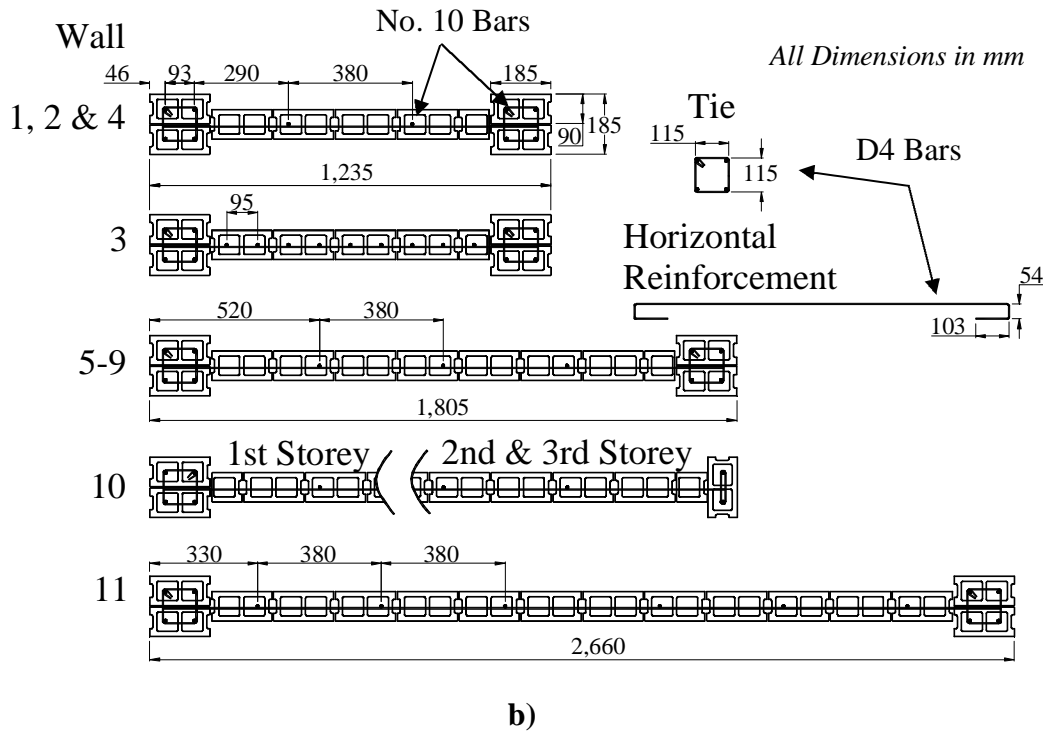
Continued... – Design Details of Walls: b) Cross-Section Details
